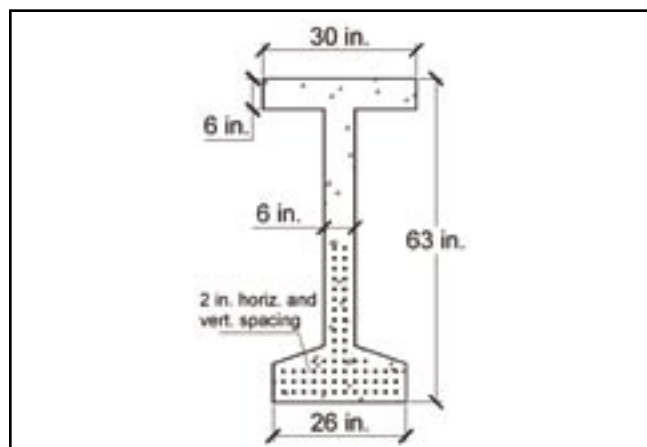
Mn/DOT Type 63 section. Note: 1 in. = 25.4 mm.
